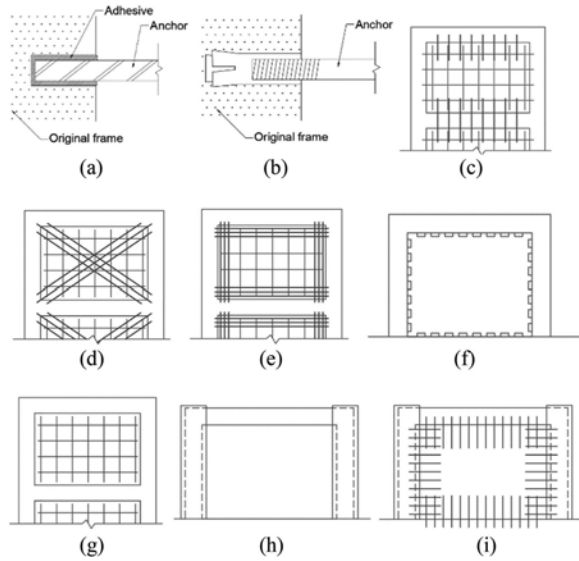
Connection between new wall and original frame: a) post-installed anchors with epoxy resin and epoxied dowel bars; b) expansion anchors; c) epoxied dowel bars in beams and horizontal reinforcement welded to existing column reinforcement; d) diagonal reinforcement welded to column reinforcement; e) wall bars concentrated at wall edges welded to the frame reinforcement; f) shear keys connected to the frame with epoxy; g) no connection of wall reinforcement nor intended surface preparation; h) RC column jacketing cast monolithically with RC infills without anchors; and i) epoxied dowel bars and RC jacketing of columns.
